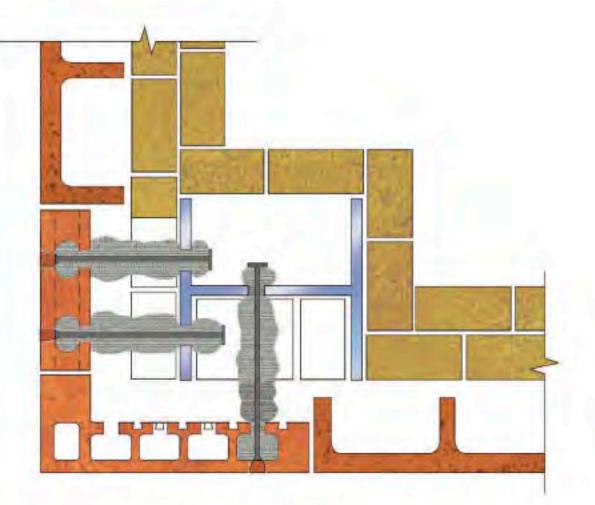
FIXING TERRA CLADDING TO A STEEL COLUMN
